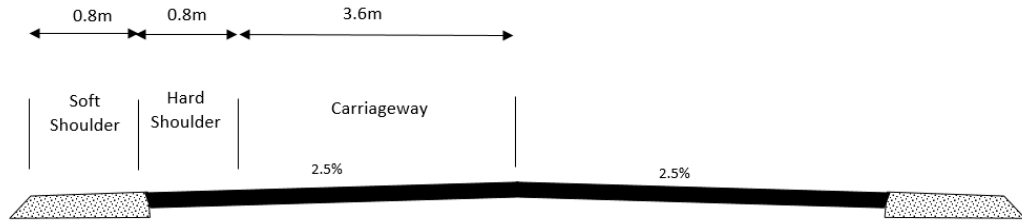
Typical cross section of A9 road Section from Vavuniya to Jaffna
